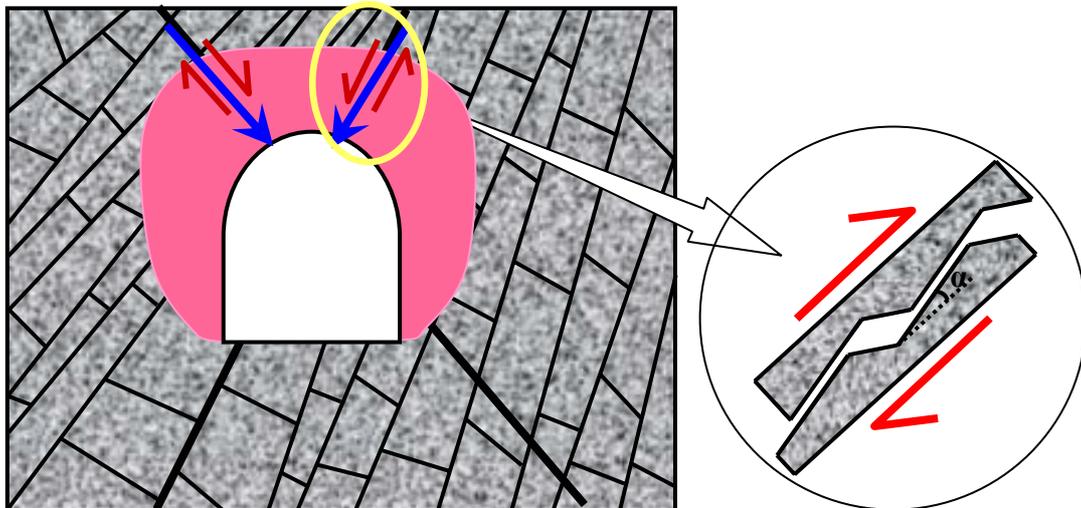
Excavation damaged zone (EDZ) and fracture opening due to shear sliding of the fractures when excavating a tunnel in a fractured rock mass.
